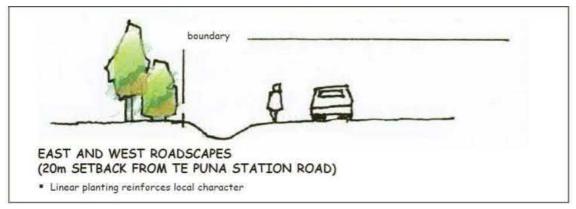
Road Scape Planting - Te Puna Station Road Planting Sections (Structure Plans)
